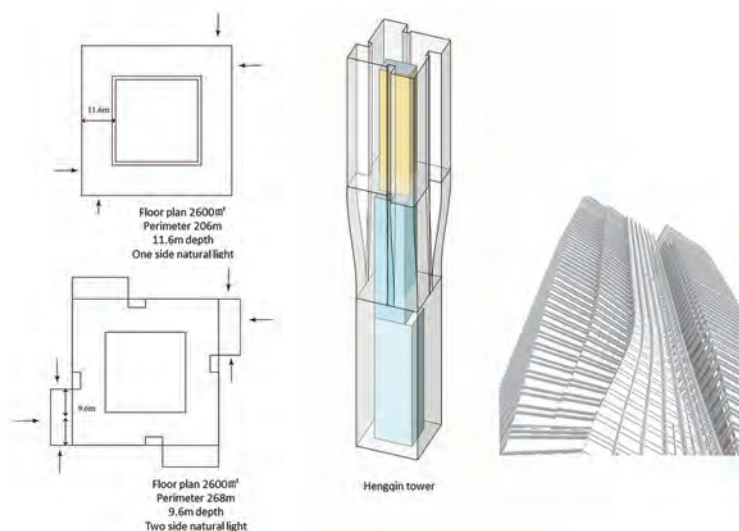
Comparison of plan layouts of Hengqing Tower (Source: Yu Wang, Aedas)
